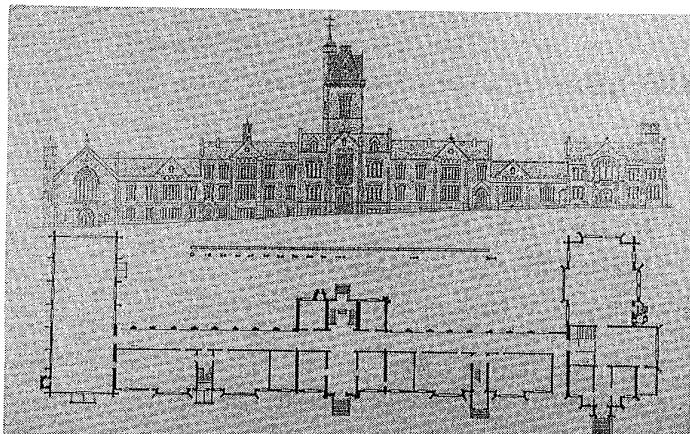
J. K. Wilson, Bethany College, Bethany, West Virginia, 1858-72 (courtesy of Bethany College).
